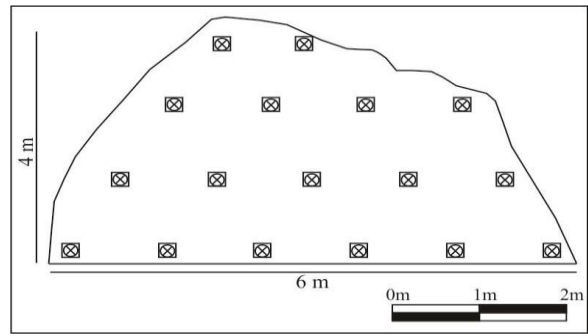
Sketch illustration *Shotcrete* with a Thickness of 3.3 inches On Slope Section 1
